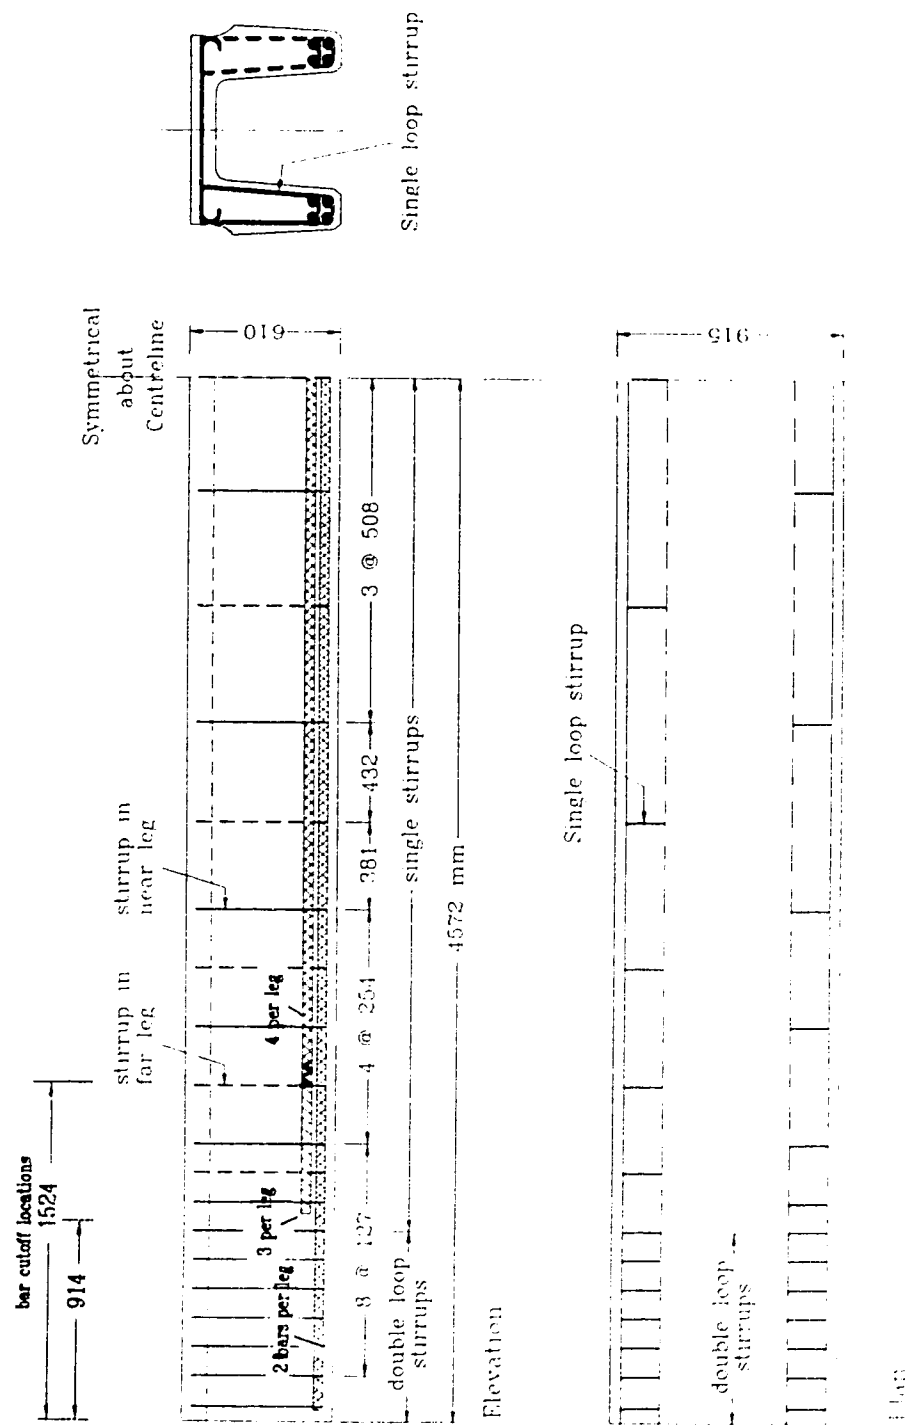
Elevation, plan and cross-section of Type 'E' girder
